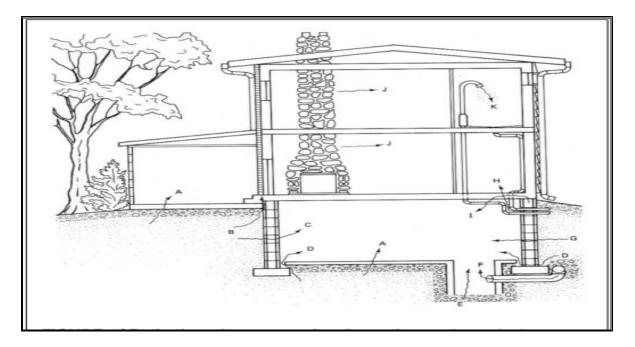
Different entering pathways of radon to enter into a house- A. radon enters through cracks in concreate slabs; B. space behind brick veneer walls that rest on hollow; C, pores and cracks in concreate blocks; D pores and cracks in concreate blocks; D, floor wall joints; E, exposed soil as in sump; F, weeping drain tile, G, mortar joints; J, building materials such as some rocks; K water from some wells (Komperød & Nrpa, 2015; Vogiannis, Nikolopoulos, & Efstathiou, 2015)
